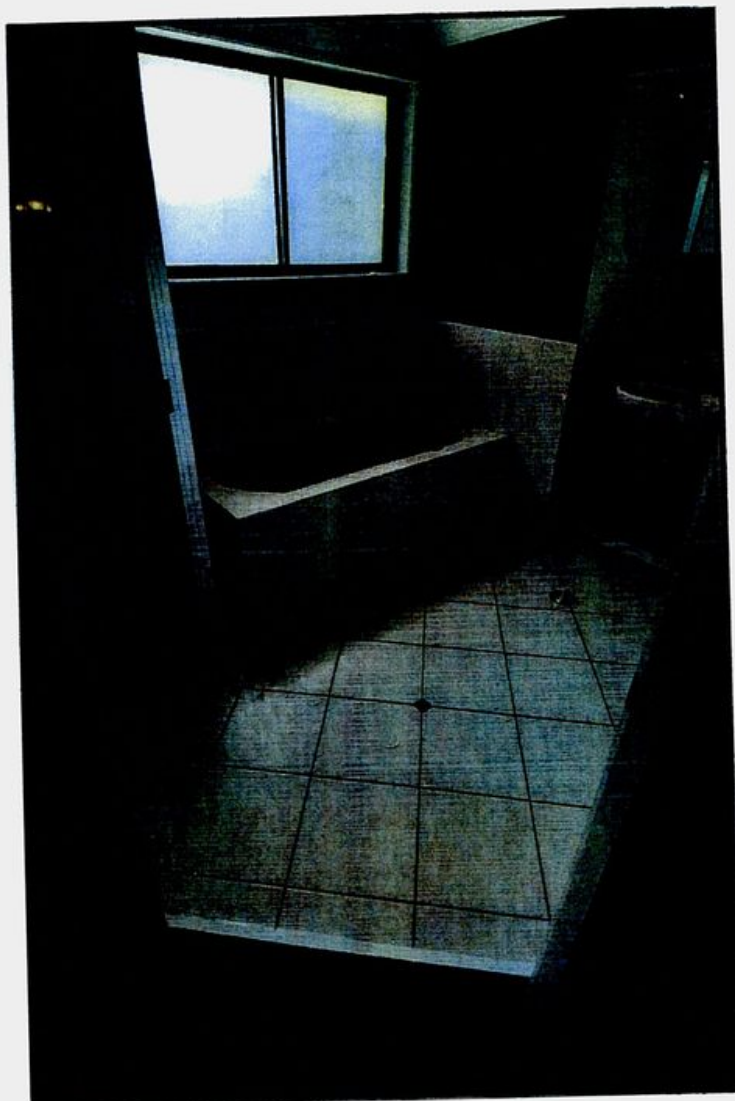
Preparation of flood testing of first floor bathroom – Main Bathroom.
